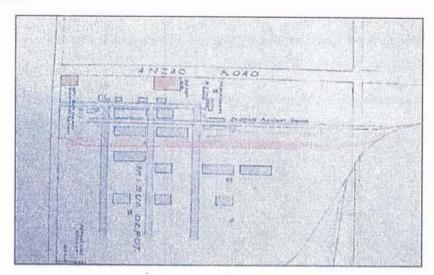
Detail of No. 1 Sub depot on corner of Anzac Rd and Moorebank Avenue 16/9/43 (Source: NAA: SP459/1, 420/7/1153)
